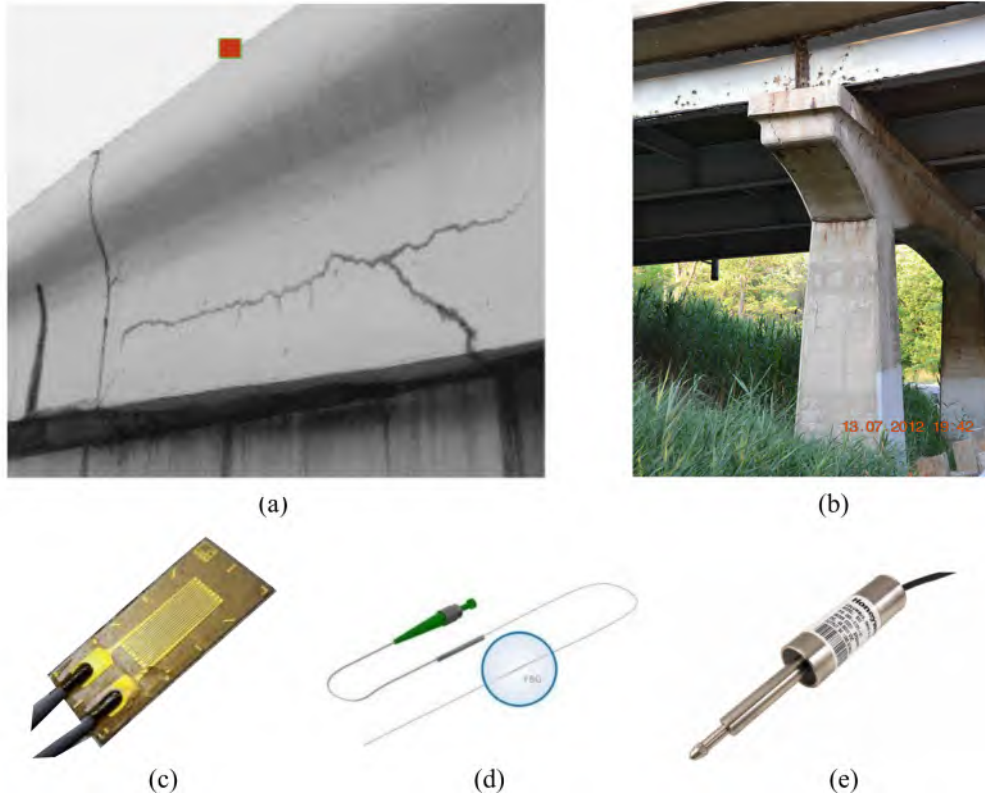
Crack formation on bridges which could potentially lead to structural failure, as shown in (a) long cracks on bridge [1] and (b) bridge showing a single crack on it [2], alongside traditional SHM sensors like (c) resistive strain gauge [3]; (d) Fiber Bragg gratings [4]; and (e) linear variable differential transformers [5].
